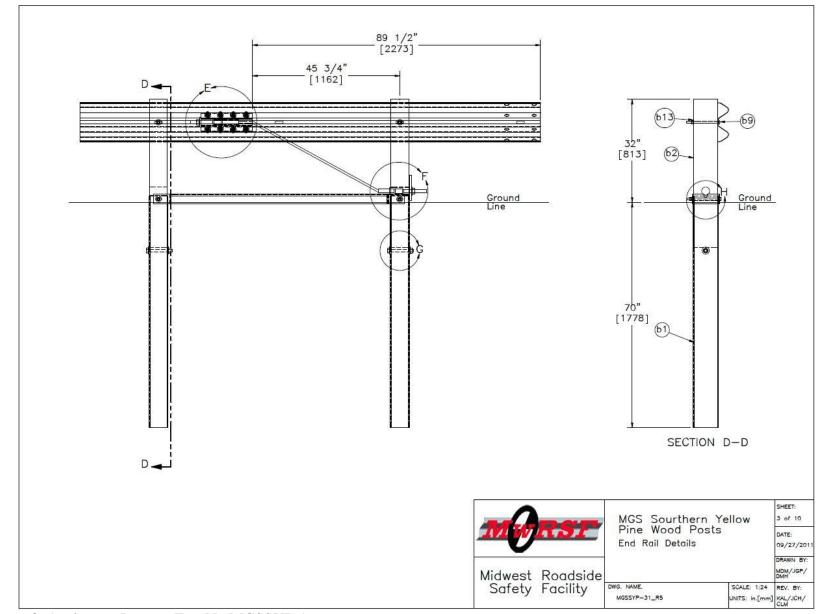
Anchorage Layout, Test No.MGSSYP-1
